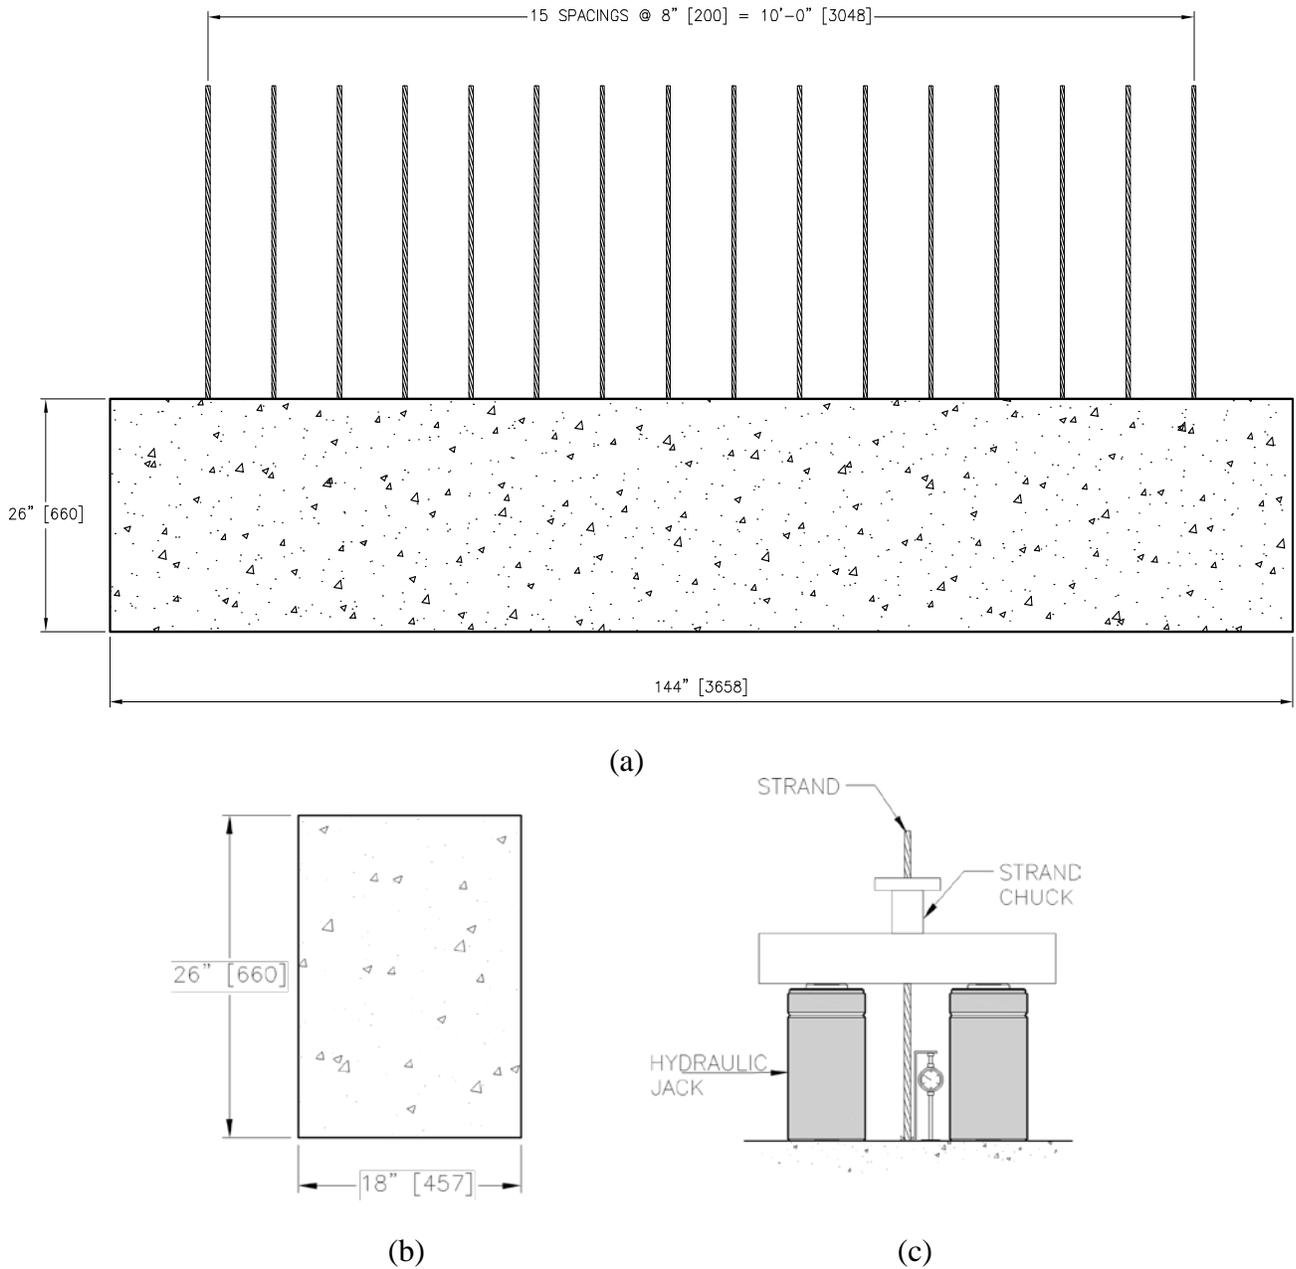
Illustration showing the elevation view of the big block and spacing of strands (a), cross-sectional dimensions of the block (b), testing layout (c).
